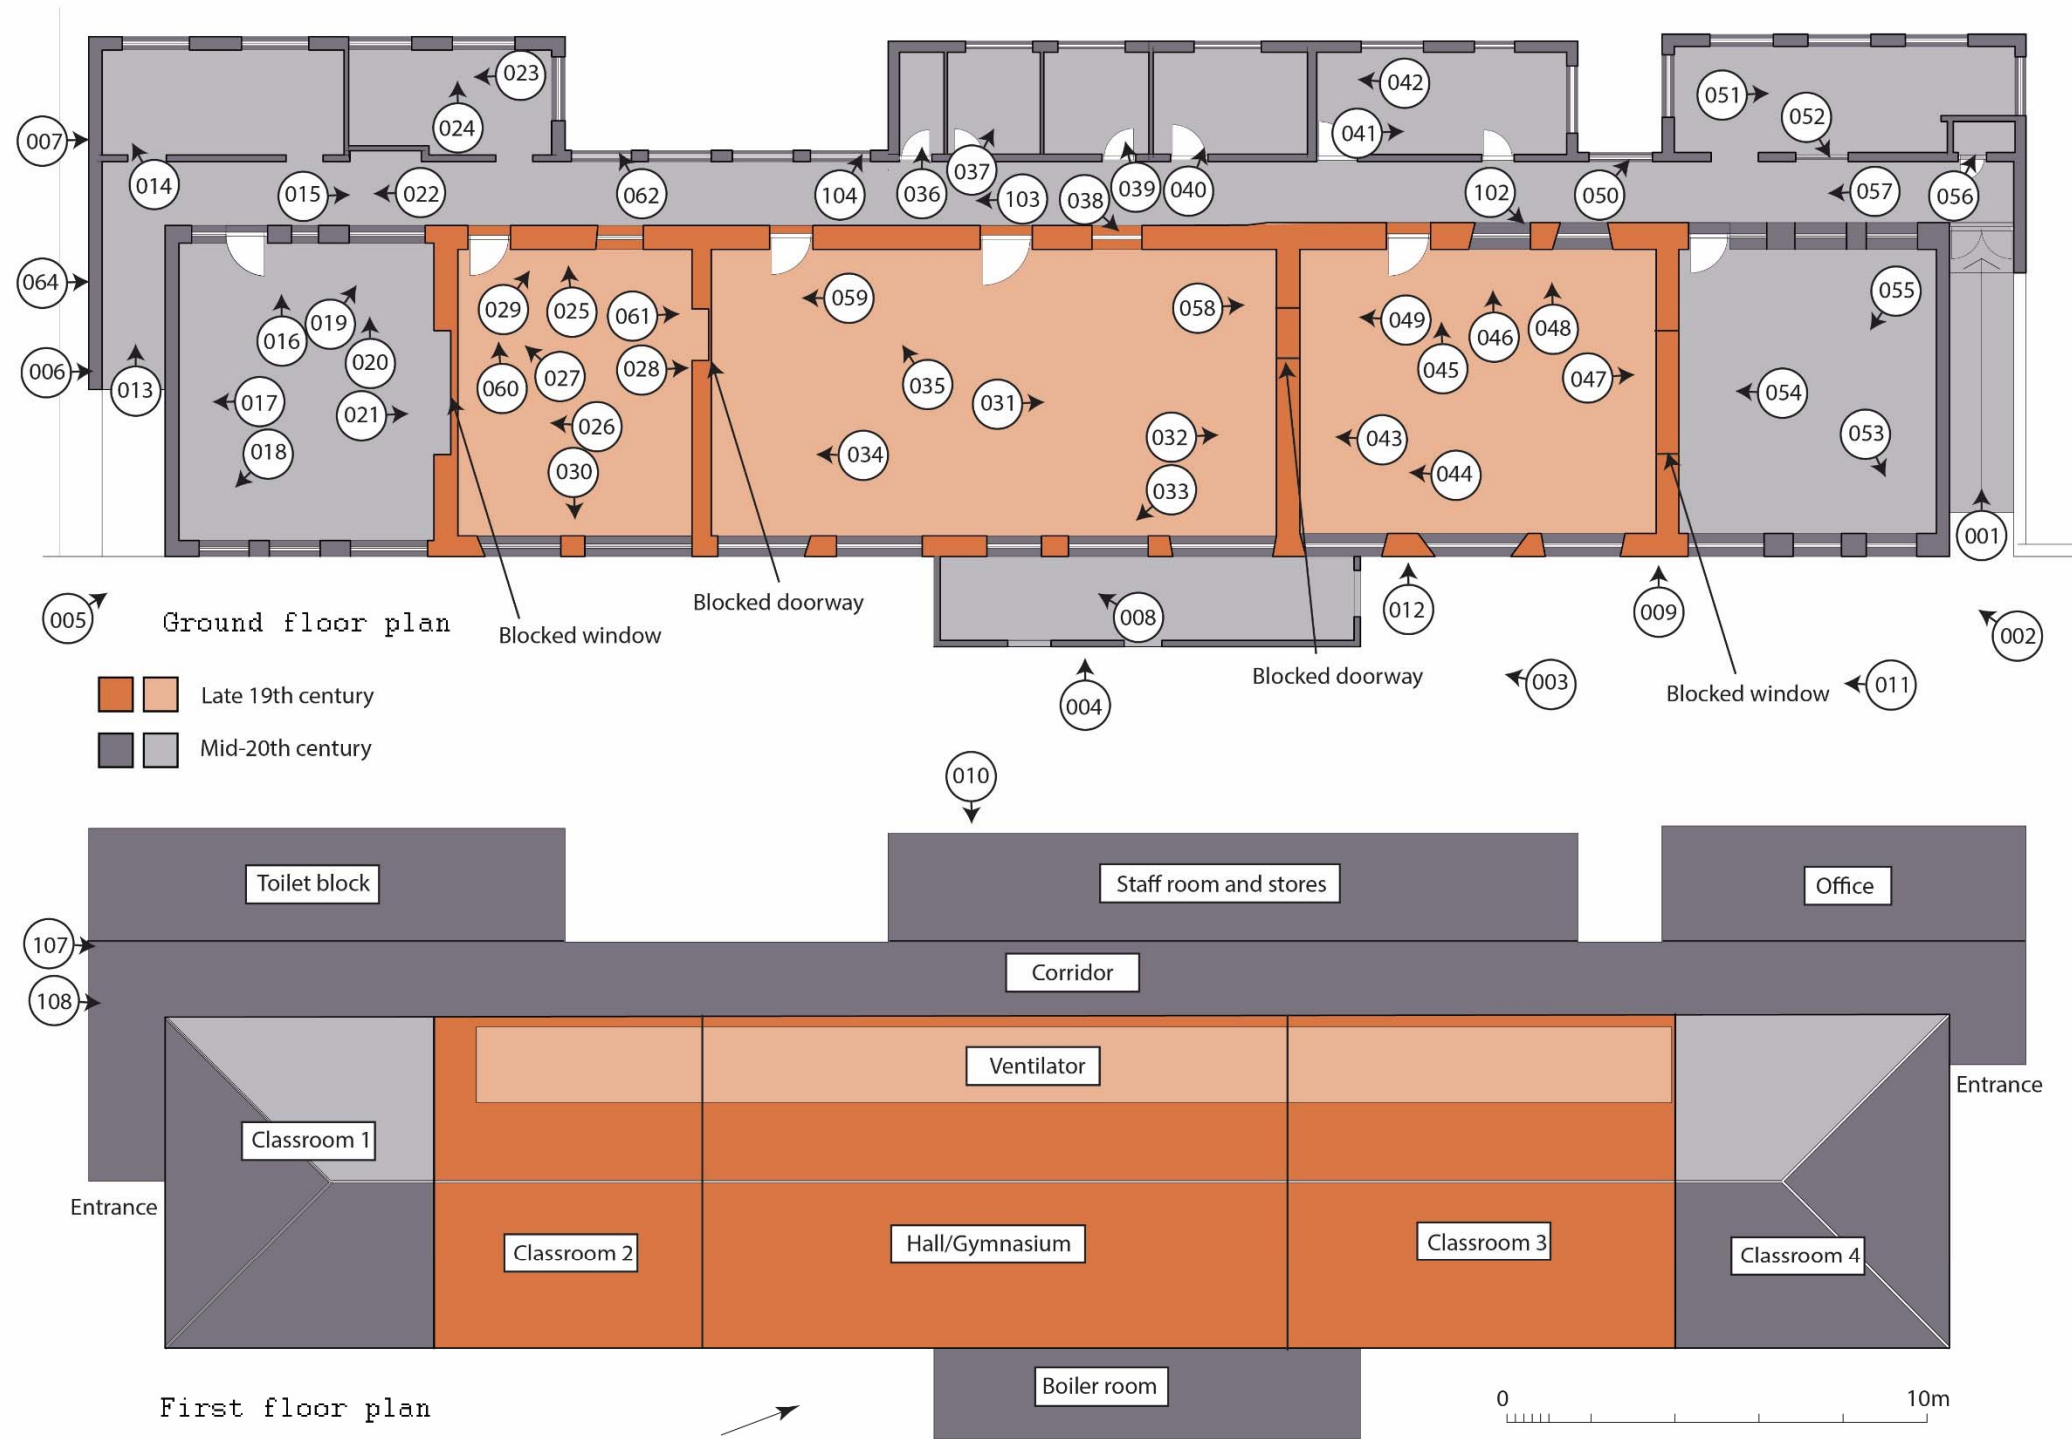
Plan of primary school building showing earlier layout (orange), later extensions (grey) and photographic locations and orientations (based on architect's plans, courtesy of Glyn Smith)
